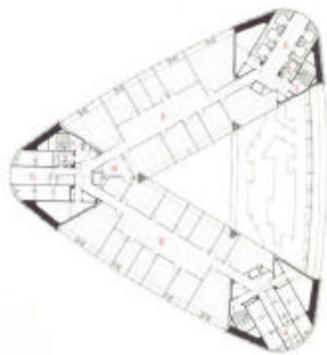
Typical Floor Plate, Commerzbank (Davies, 1997)
